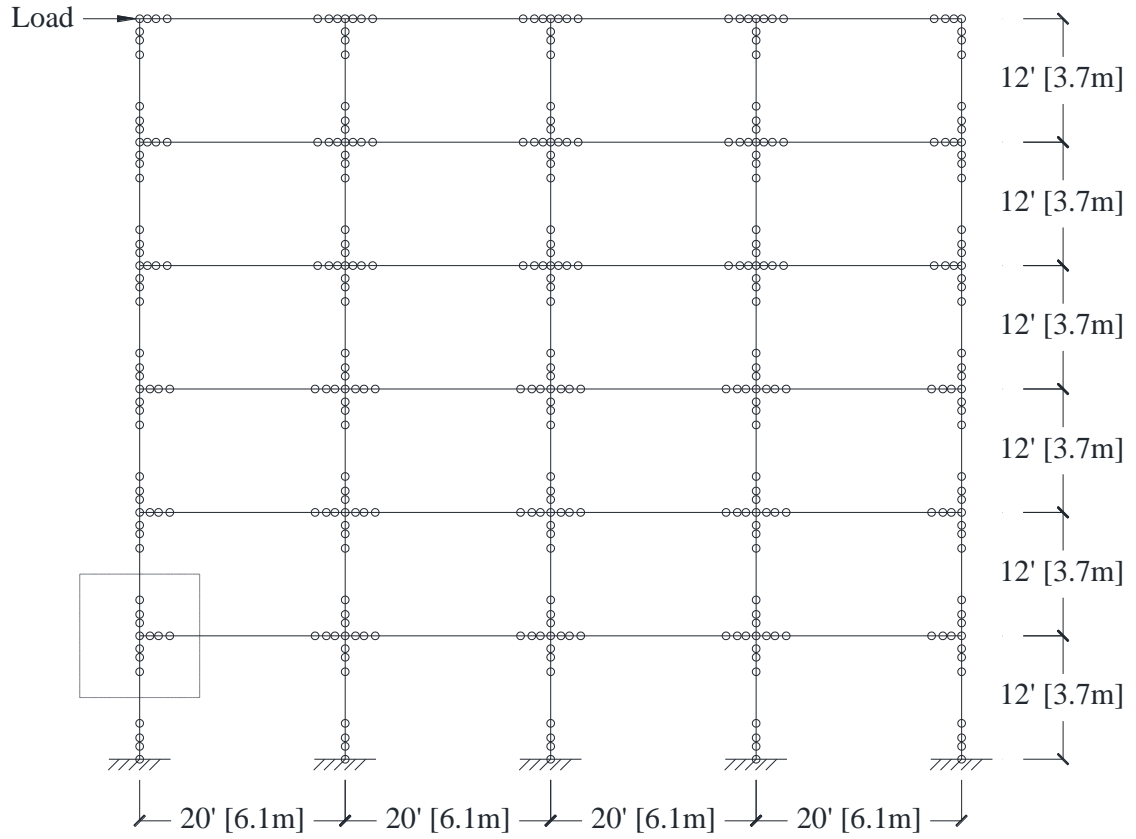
Elevation View for a Mechanically Spliced Beam-Column Joint
